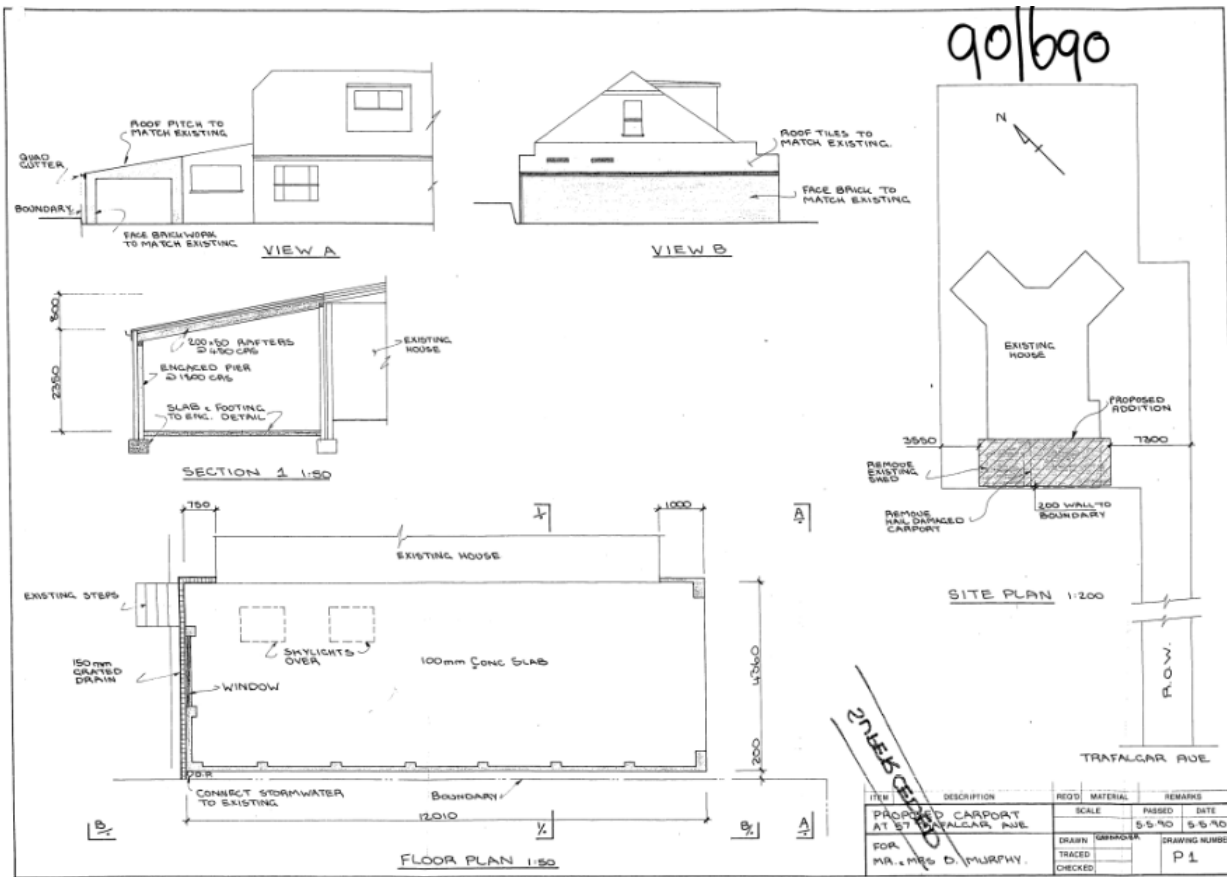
Plans indicating demolition of existing carport and construction of replacement covered carport
